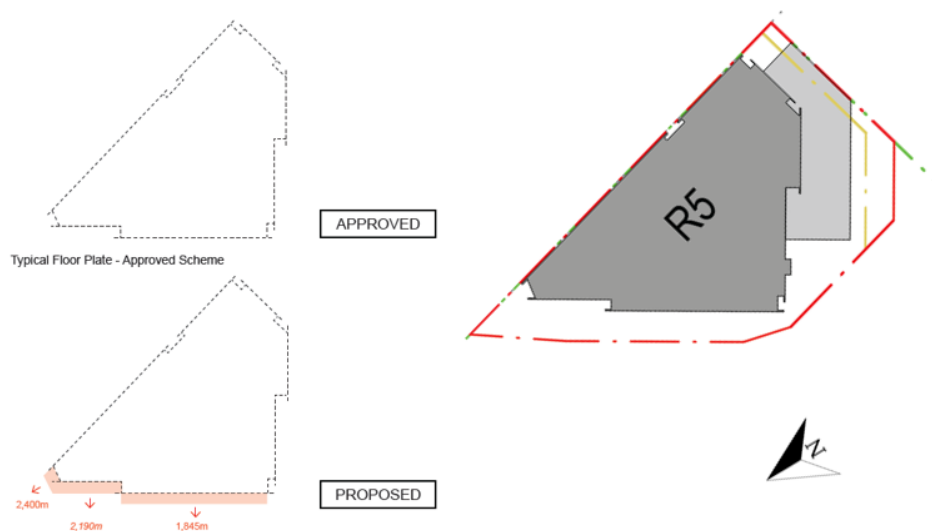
| Proposed extension of the Hickson Park façade (left) and proposed R5 building with approved building envelope boundary in red (right) (Base source: Applicant's Design Report and Architectural Plans)
